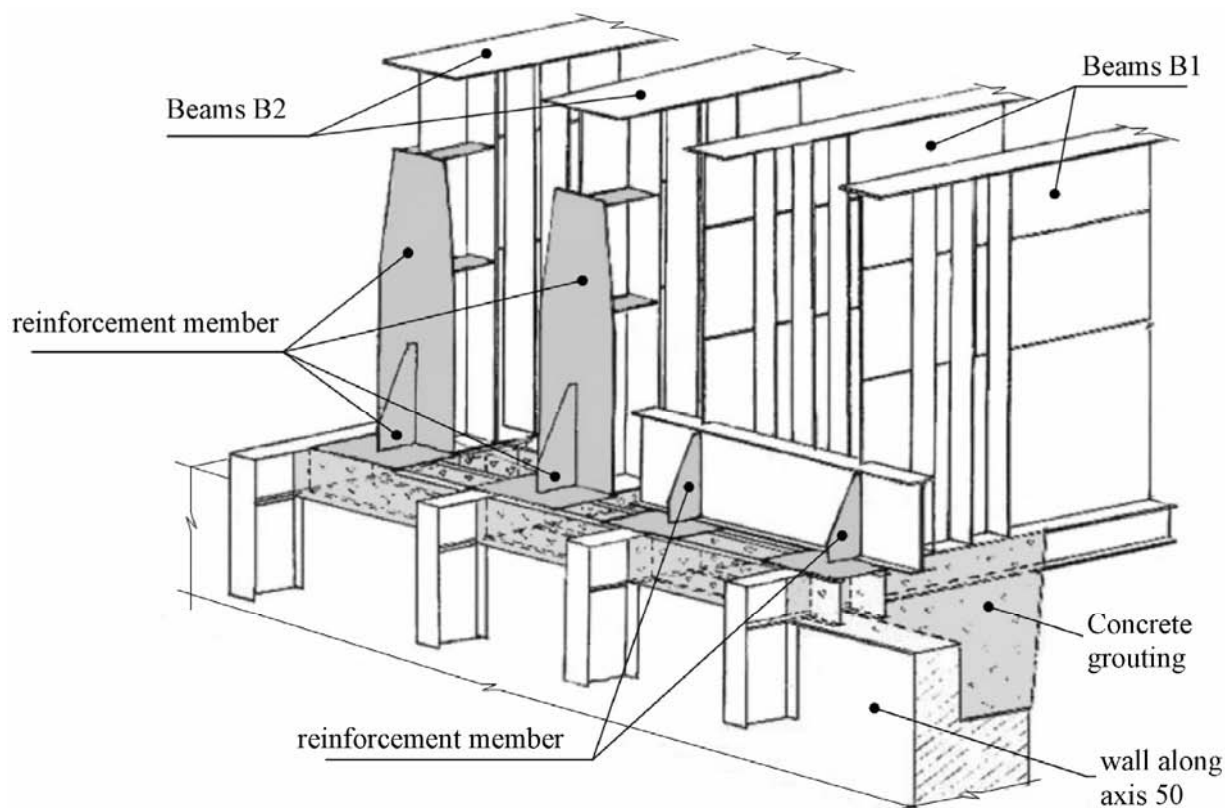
B-1 and B-2 reinforcement (in colour additional reinforcement as of 1999).
